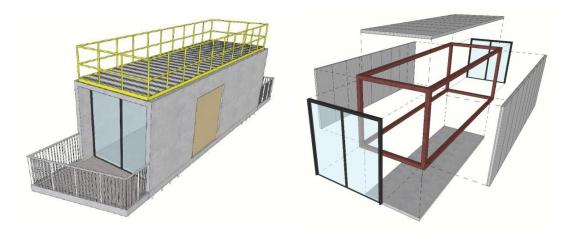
Reinforced concrete and steel modules in modular buildings (BCA, 2017)
